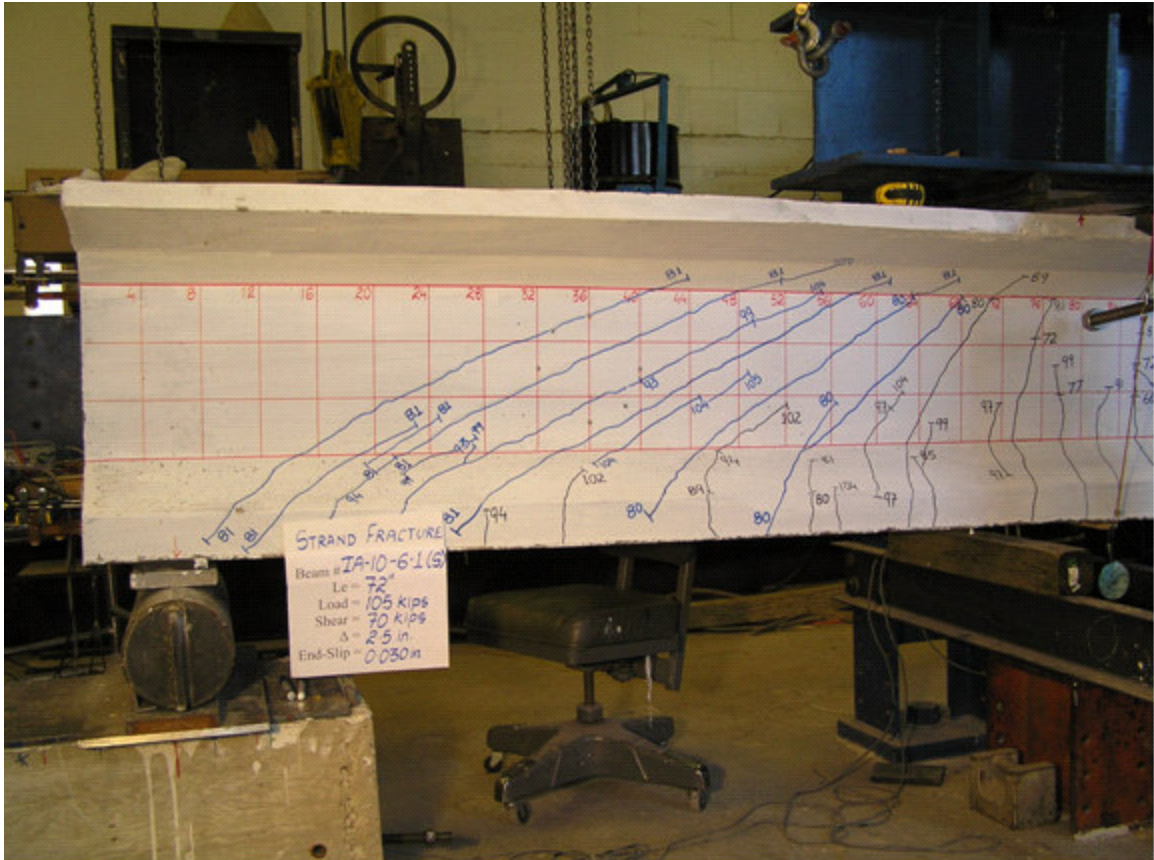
Photo of South end of beam IA-10-6-1 showing the cracking pattern at strand fracture
